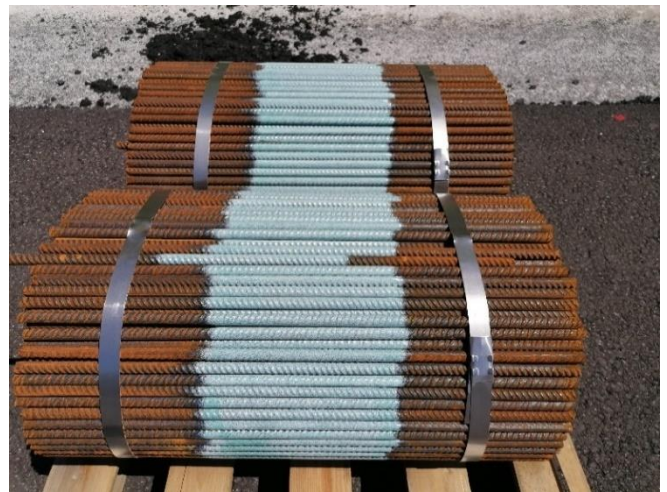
The anchor made of ribbed reinforcing steel B500B, Source: K. Hrapović, 2021
